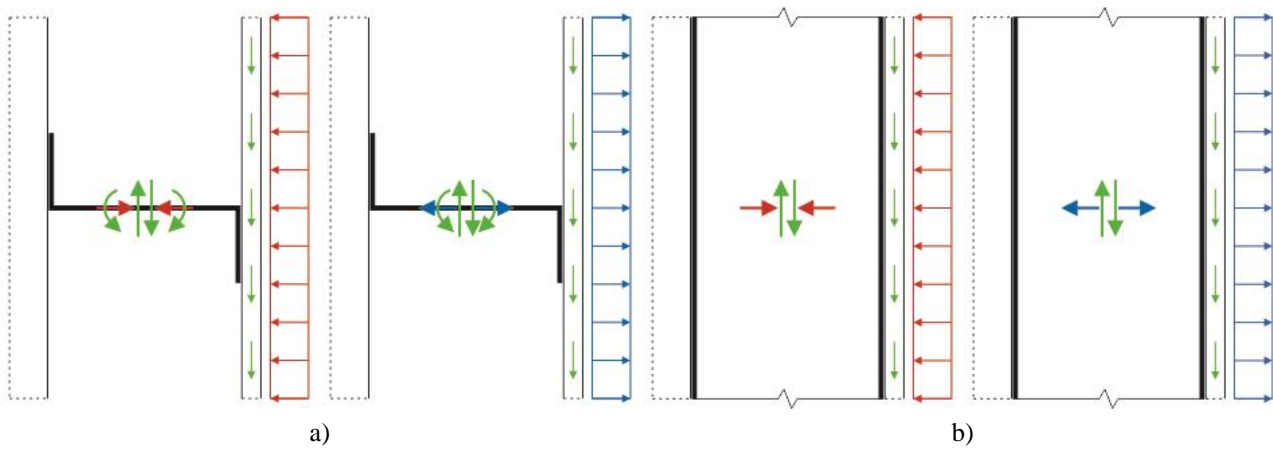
Loads acting on a horizontally (a) or vertically (b) installed Z-section causing forces within or transverse to the web plane
